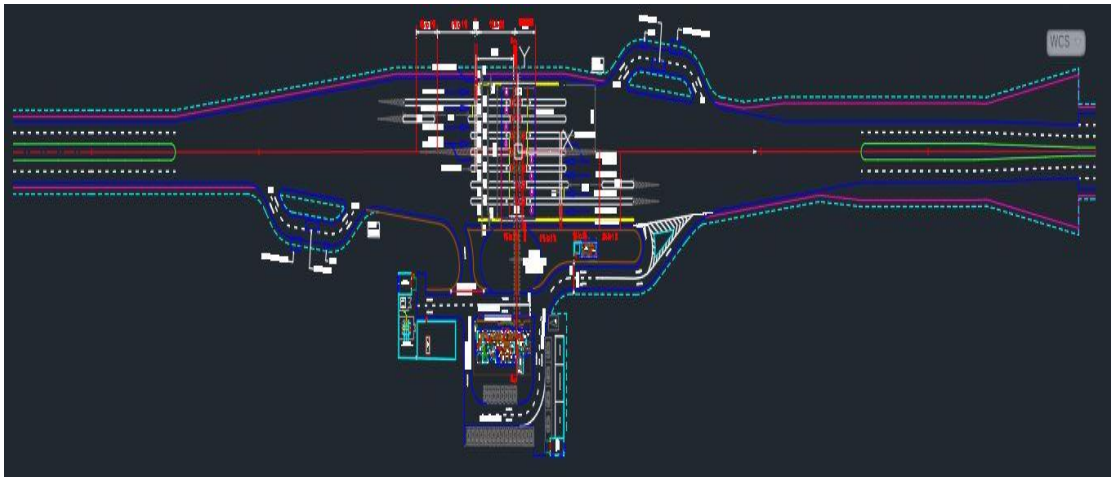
Plan layout of 8 lane toll plaza with approach road and weigh bridge
